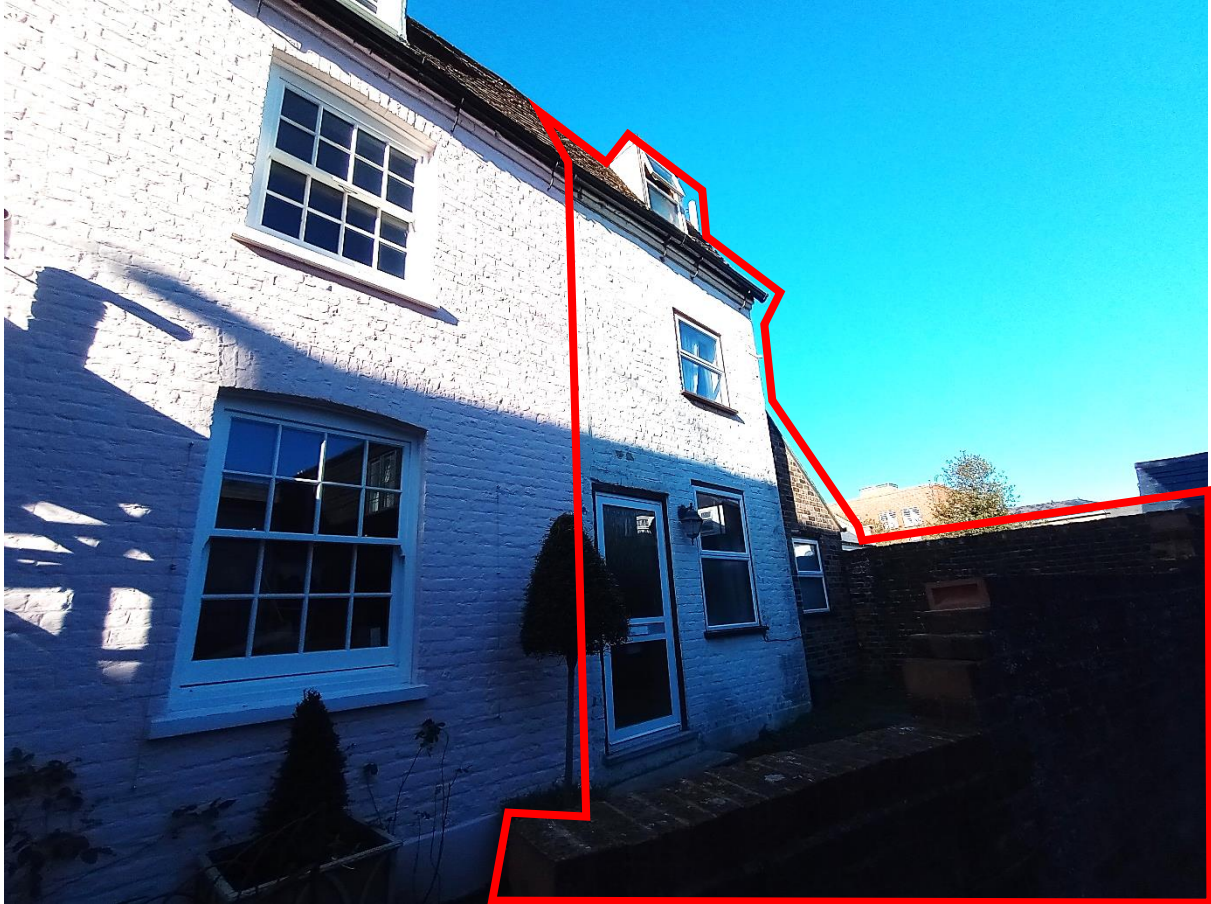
Braunton extension has windows and doors that do not match. The brick perimeter wall is failing structurally
